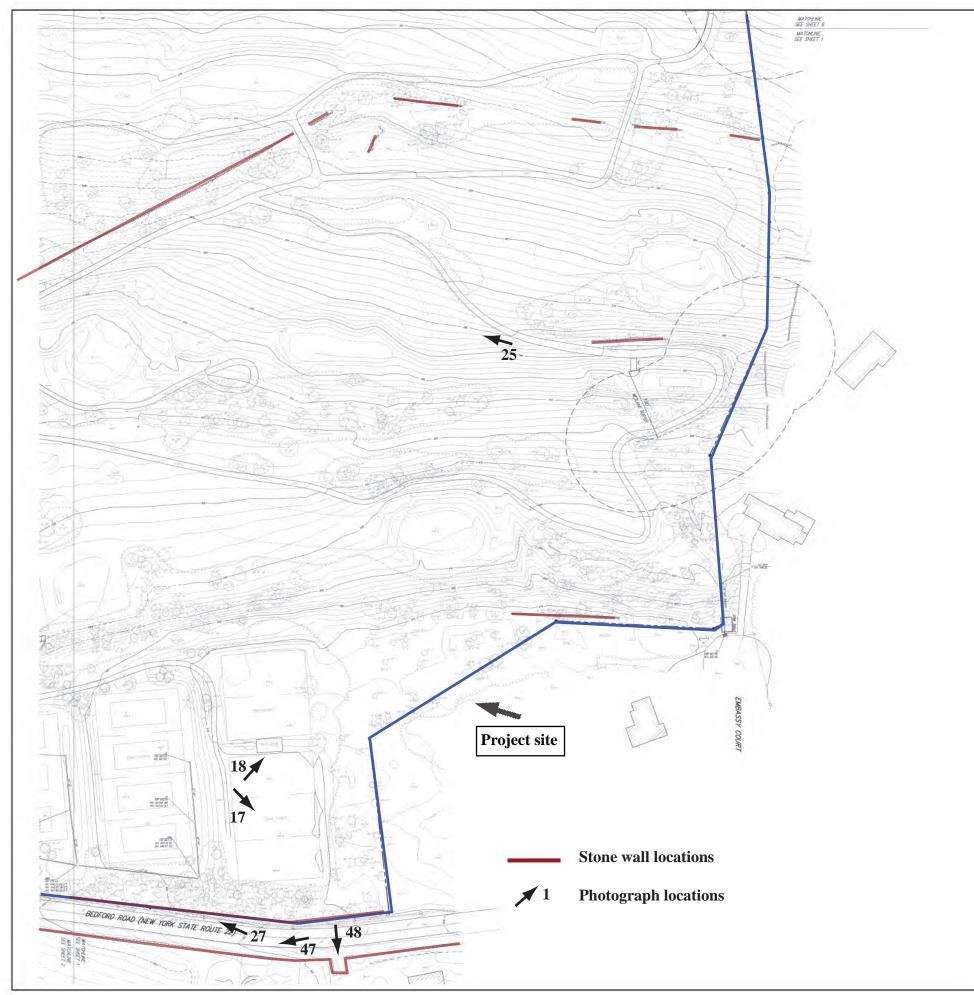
Section of project site topographical survey showing existing conditions, stone walls, and photograph locations (JMC 2012).
